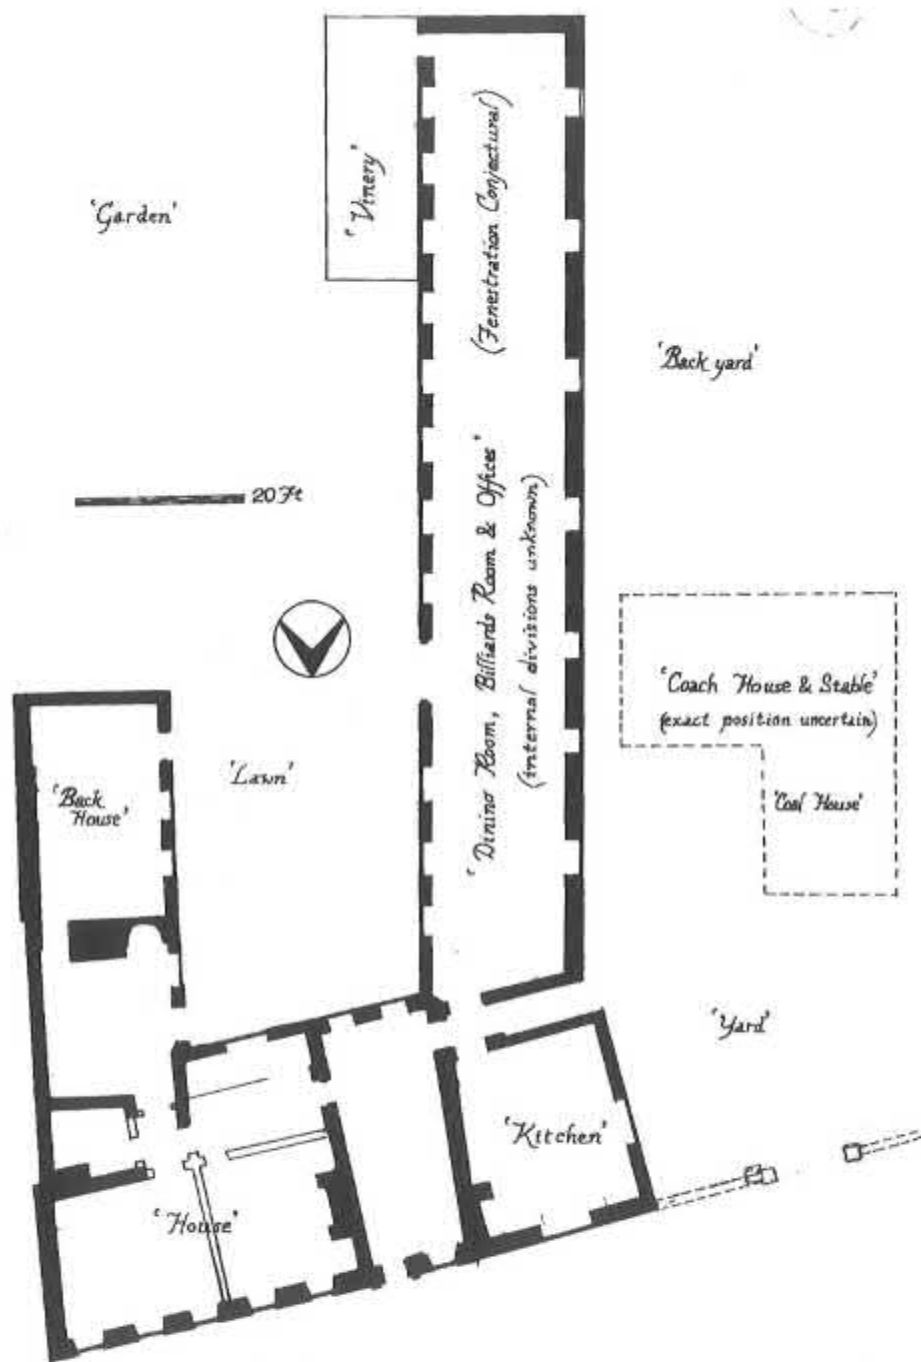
The house as left by the Wests; redrawn from sketch plan of 1862, incorporating the school buildings; room names after sketch plan.
